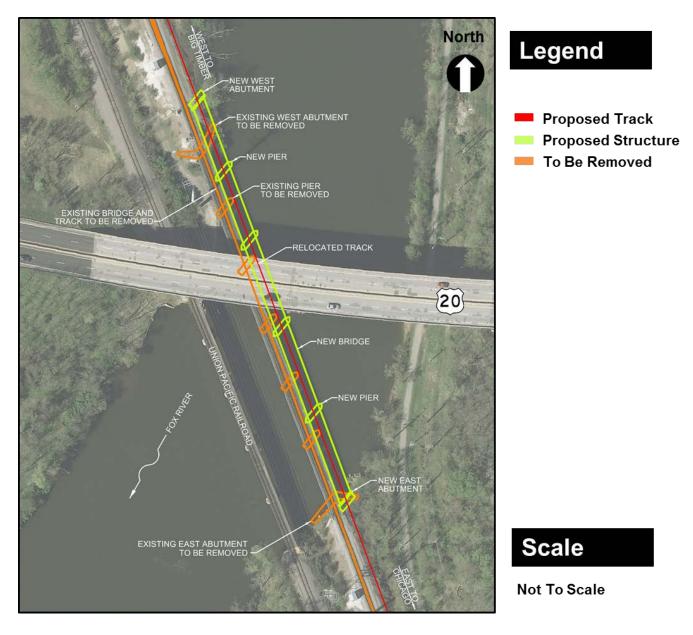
Components of Alternative 3 – Construct a New Single-Track Bridge on an Upstream Alignment
